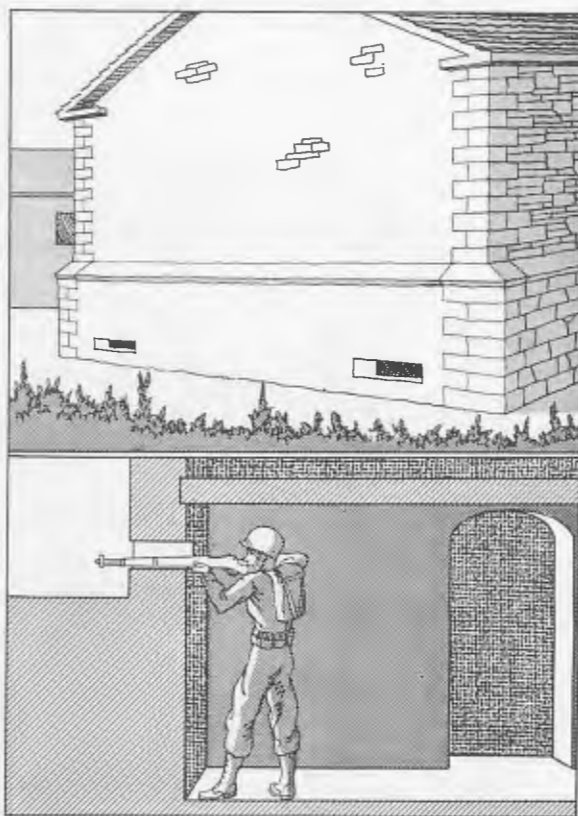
Typical firing ports and observations slits in wall of masonry building.
